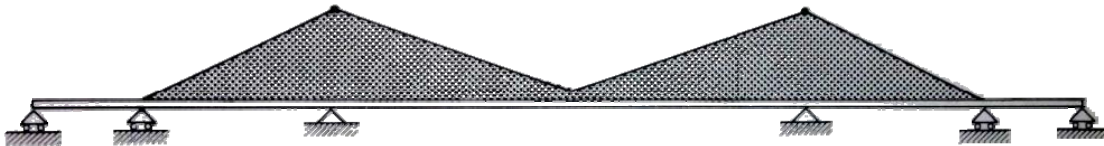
Cable supported bridge with stiffening girder continued into short beam spans
